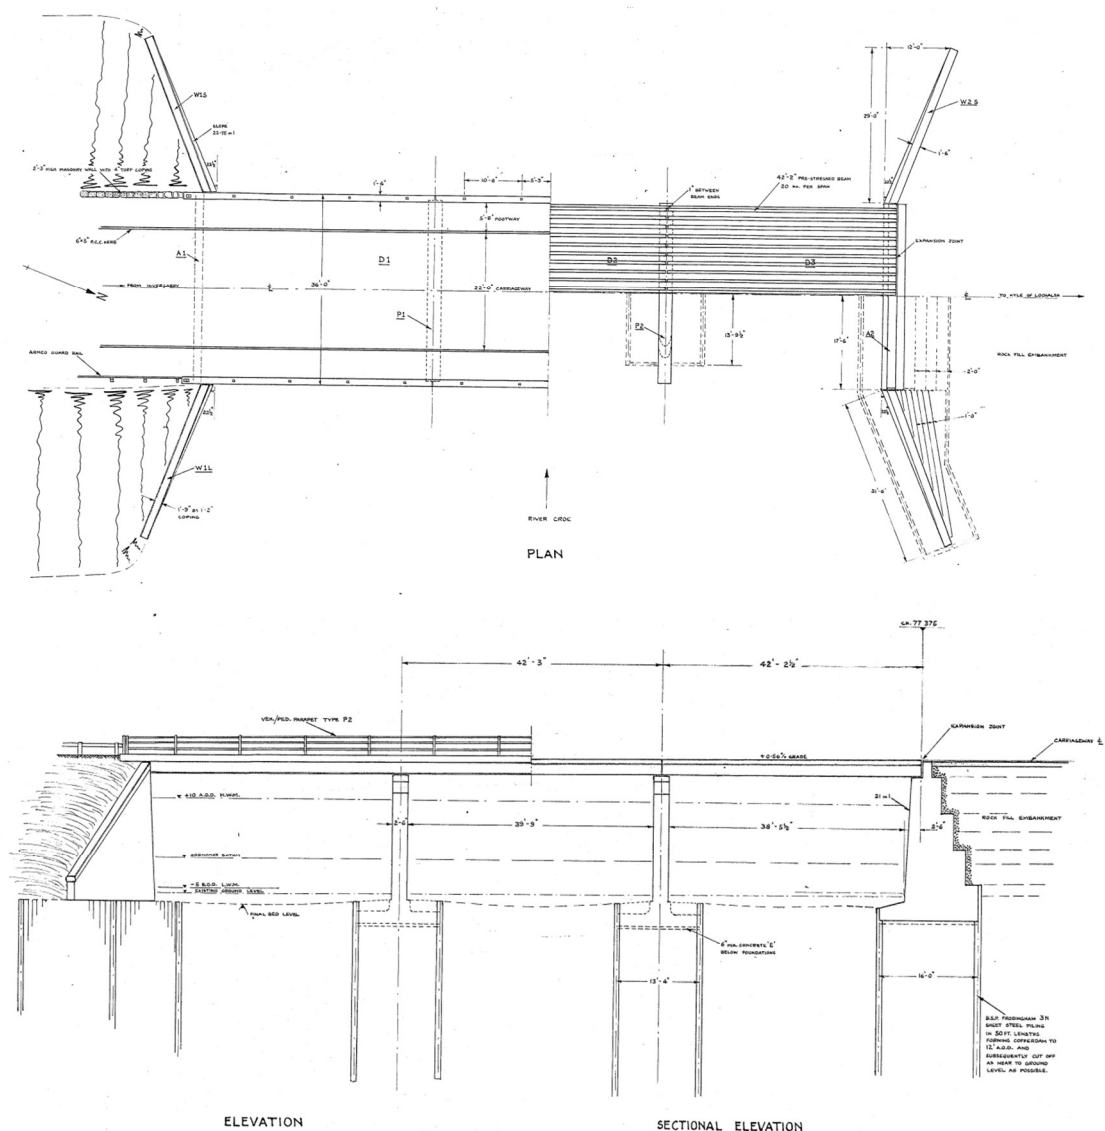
A87 Clachan Duich Bridge typical elevation and cross section
